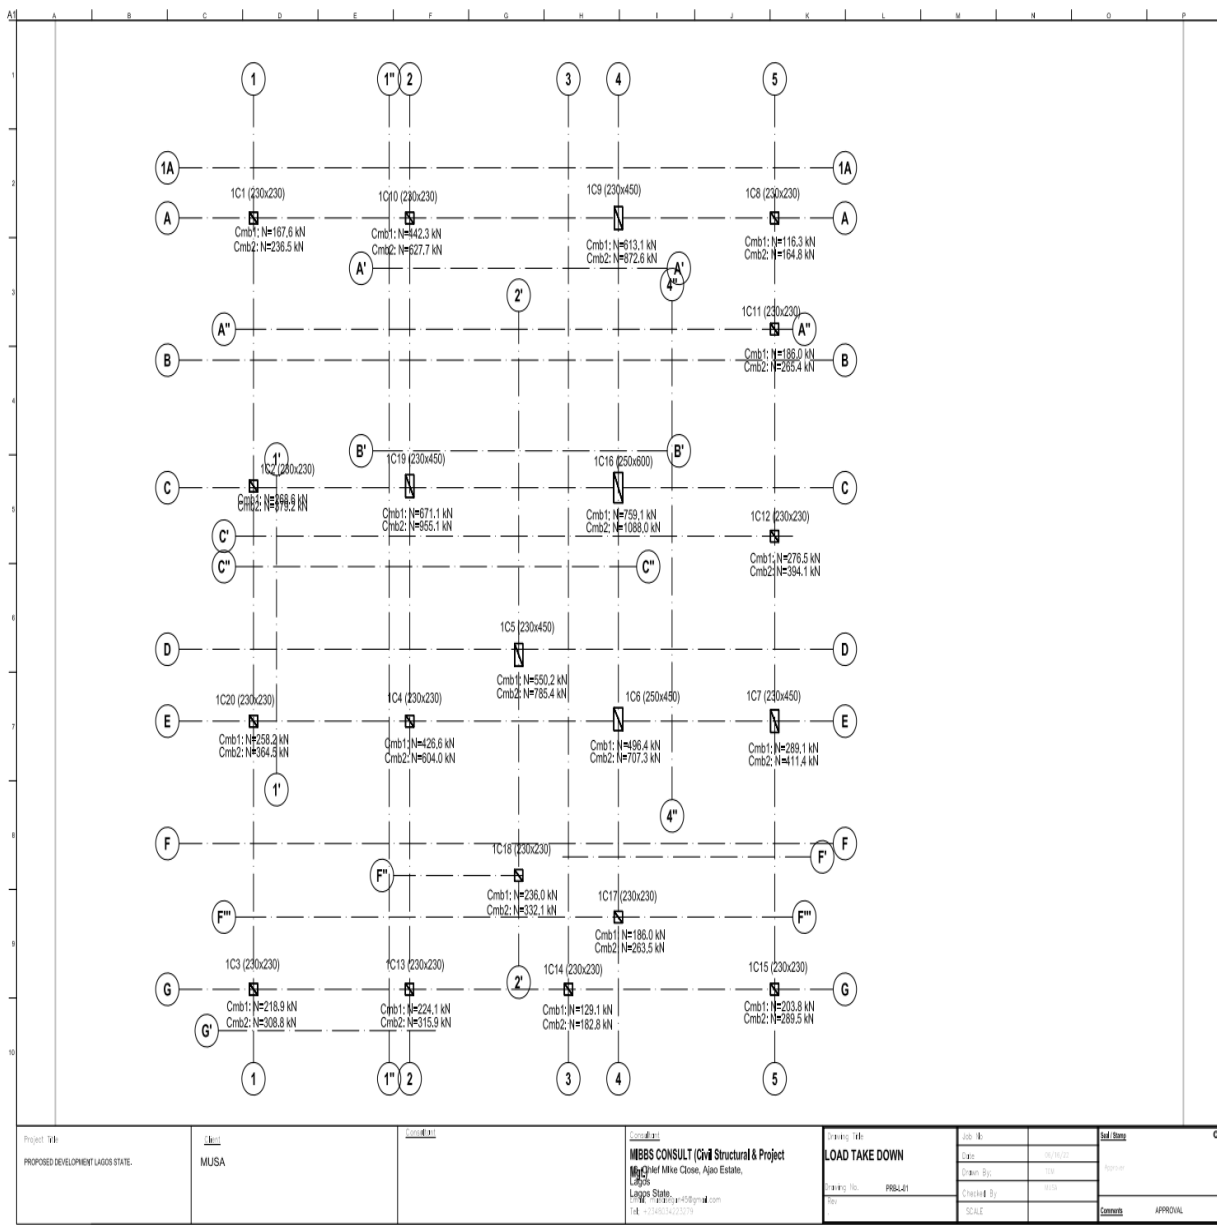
FOUNDATION LOADS (C1_SLS & C2_ULT) FROM SUPERSTRUCTURE (SEE APPENDIX 2 FOR A3 SIZE)
